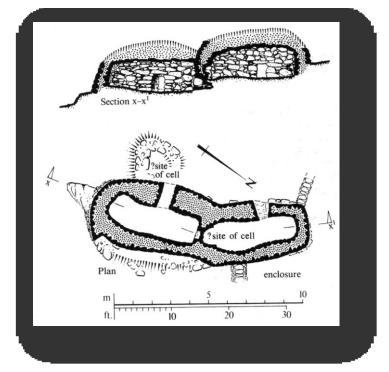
Plan and sectional elevation of Structure 144-5 (RCAHMS 1988). Inked drawing DC 10811 © RCAHMS.
